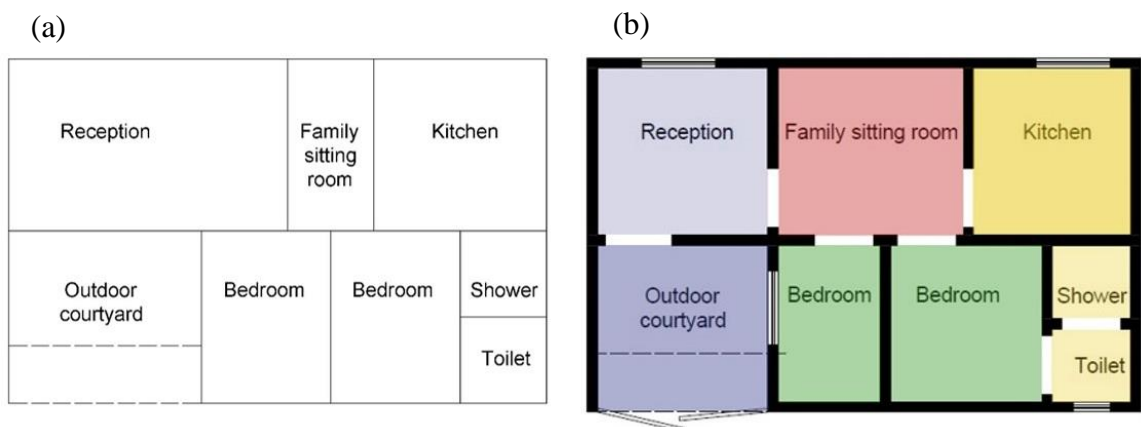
Azraq camp- Group 1: a) Zoning of spaces, b) Plan with openings
